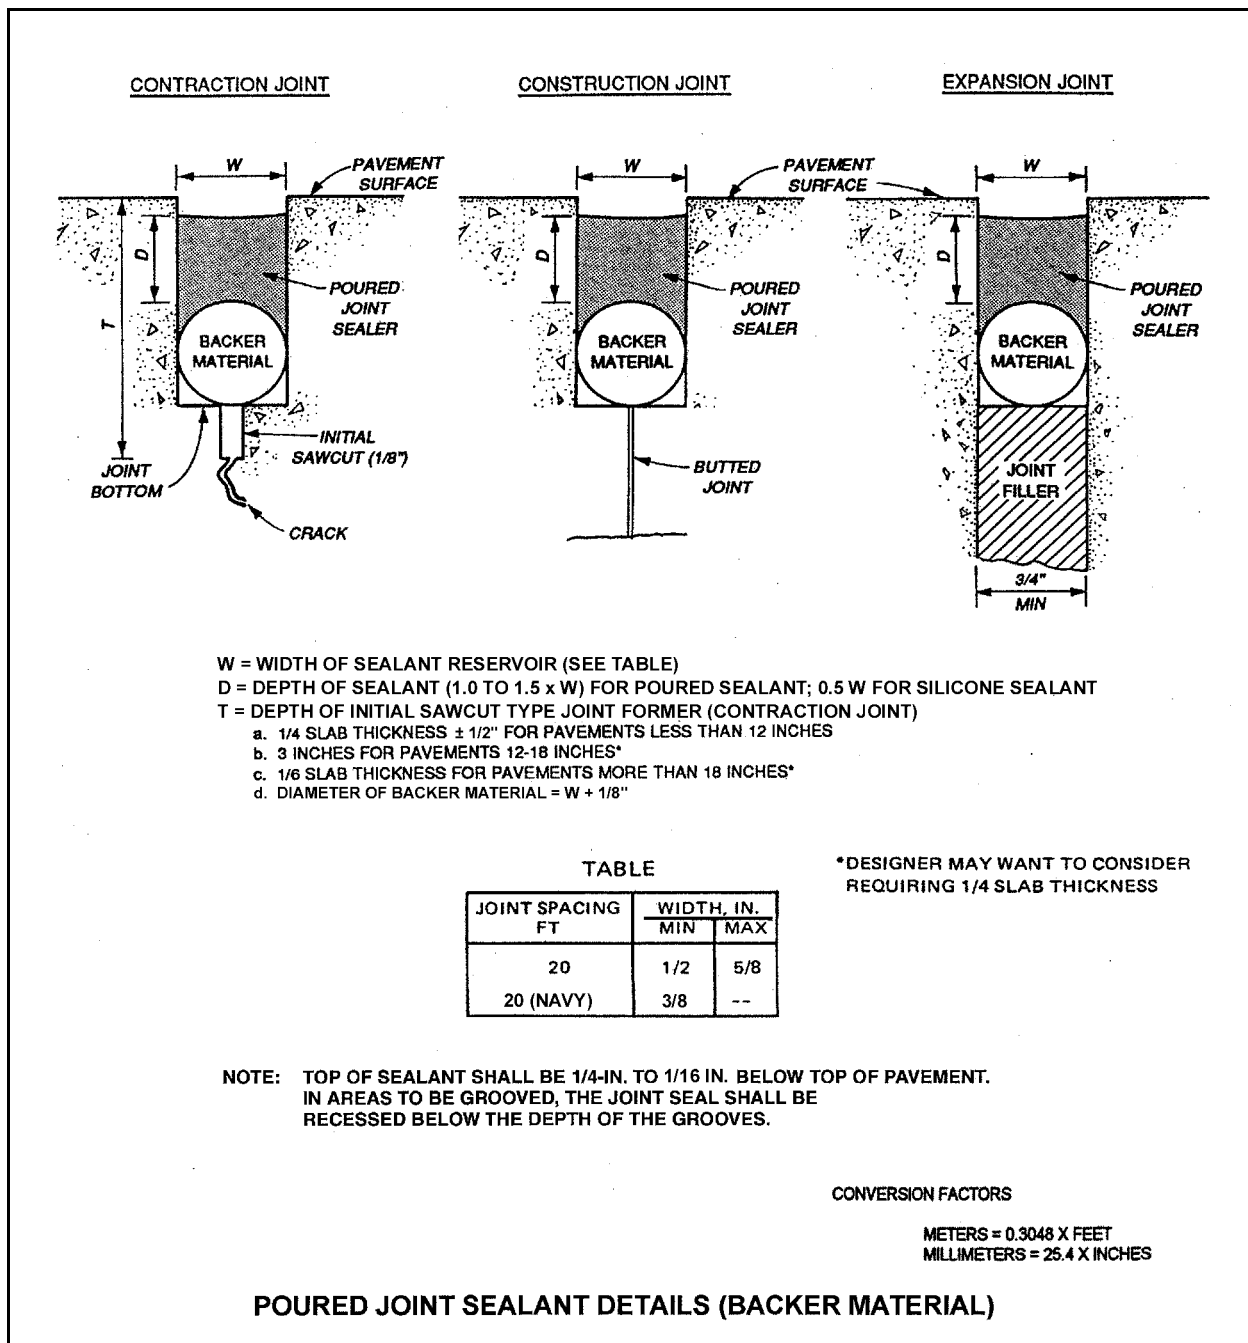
Joint sealant details for plain concrete pavements (Sheet 1 of 3)
